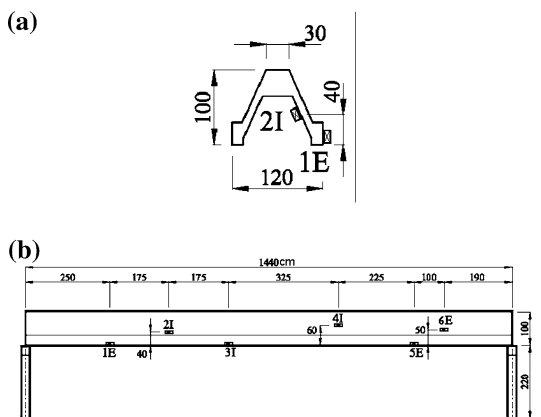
(a) Beam cross-section indicating the position of the USAM[®] transducers. The ATEL[®] transducers are applied on the opposite side. (b) Lateral view of the beam indicating the positions of the six USAM[®] transducers
